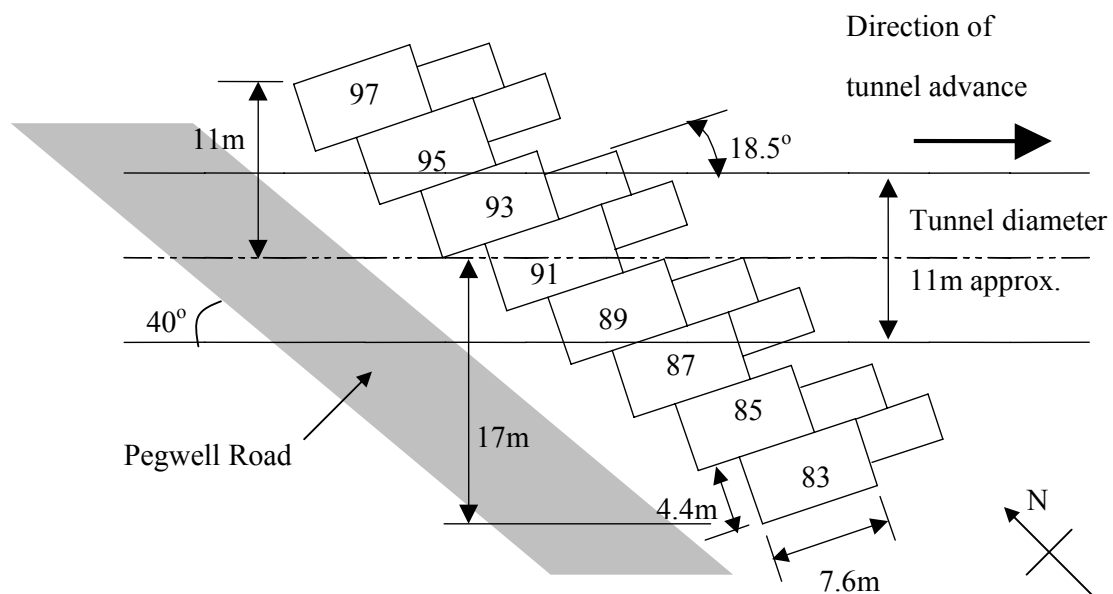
Plan on Pegwell Road cottages showing tunnel alignment
